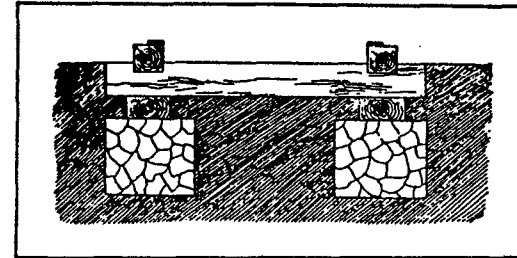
Iron strap rail, spiked to wooden stringers and supported by wooden ties over a gravel and wood sub-foundation.
